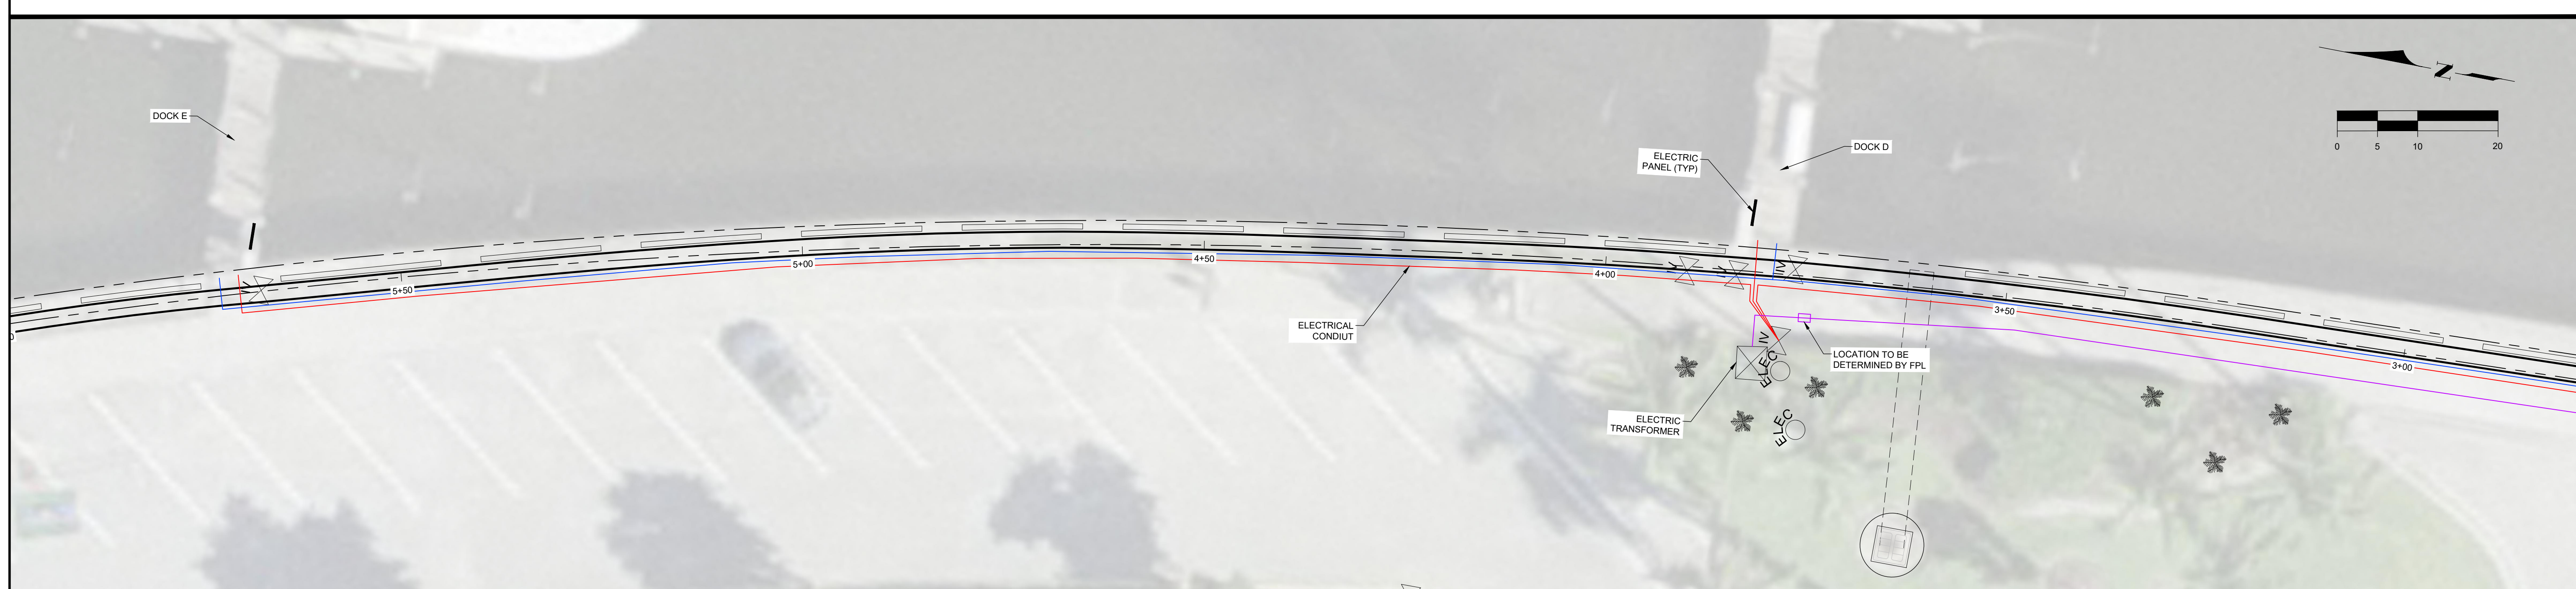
Exhibit B - Venetian Yacht Club North Electrical & Water Plan
